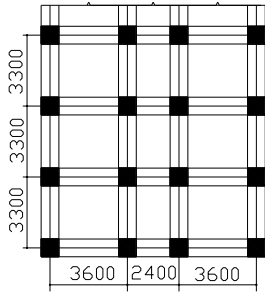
The Plan view of the Simulated Multi-storey, Multi-bay Reinforced Concrete Building.
